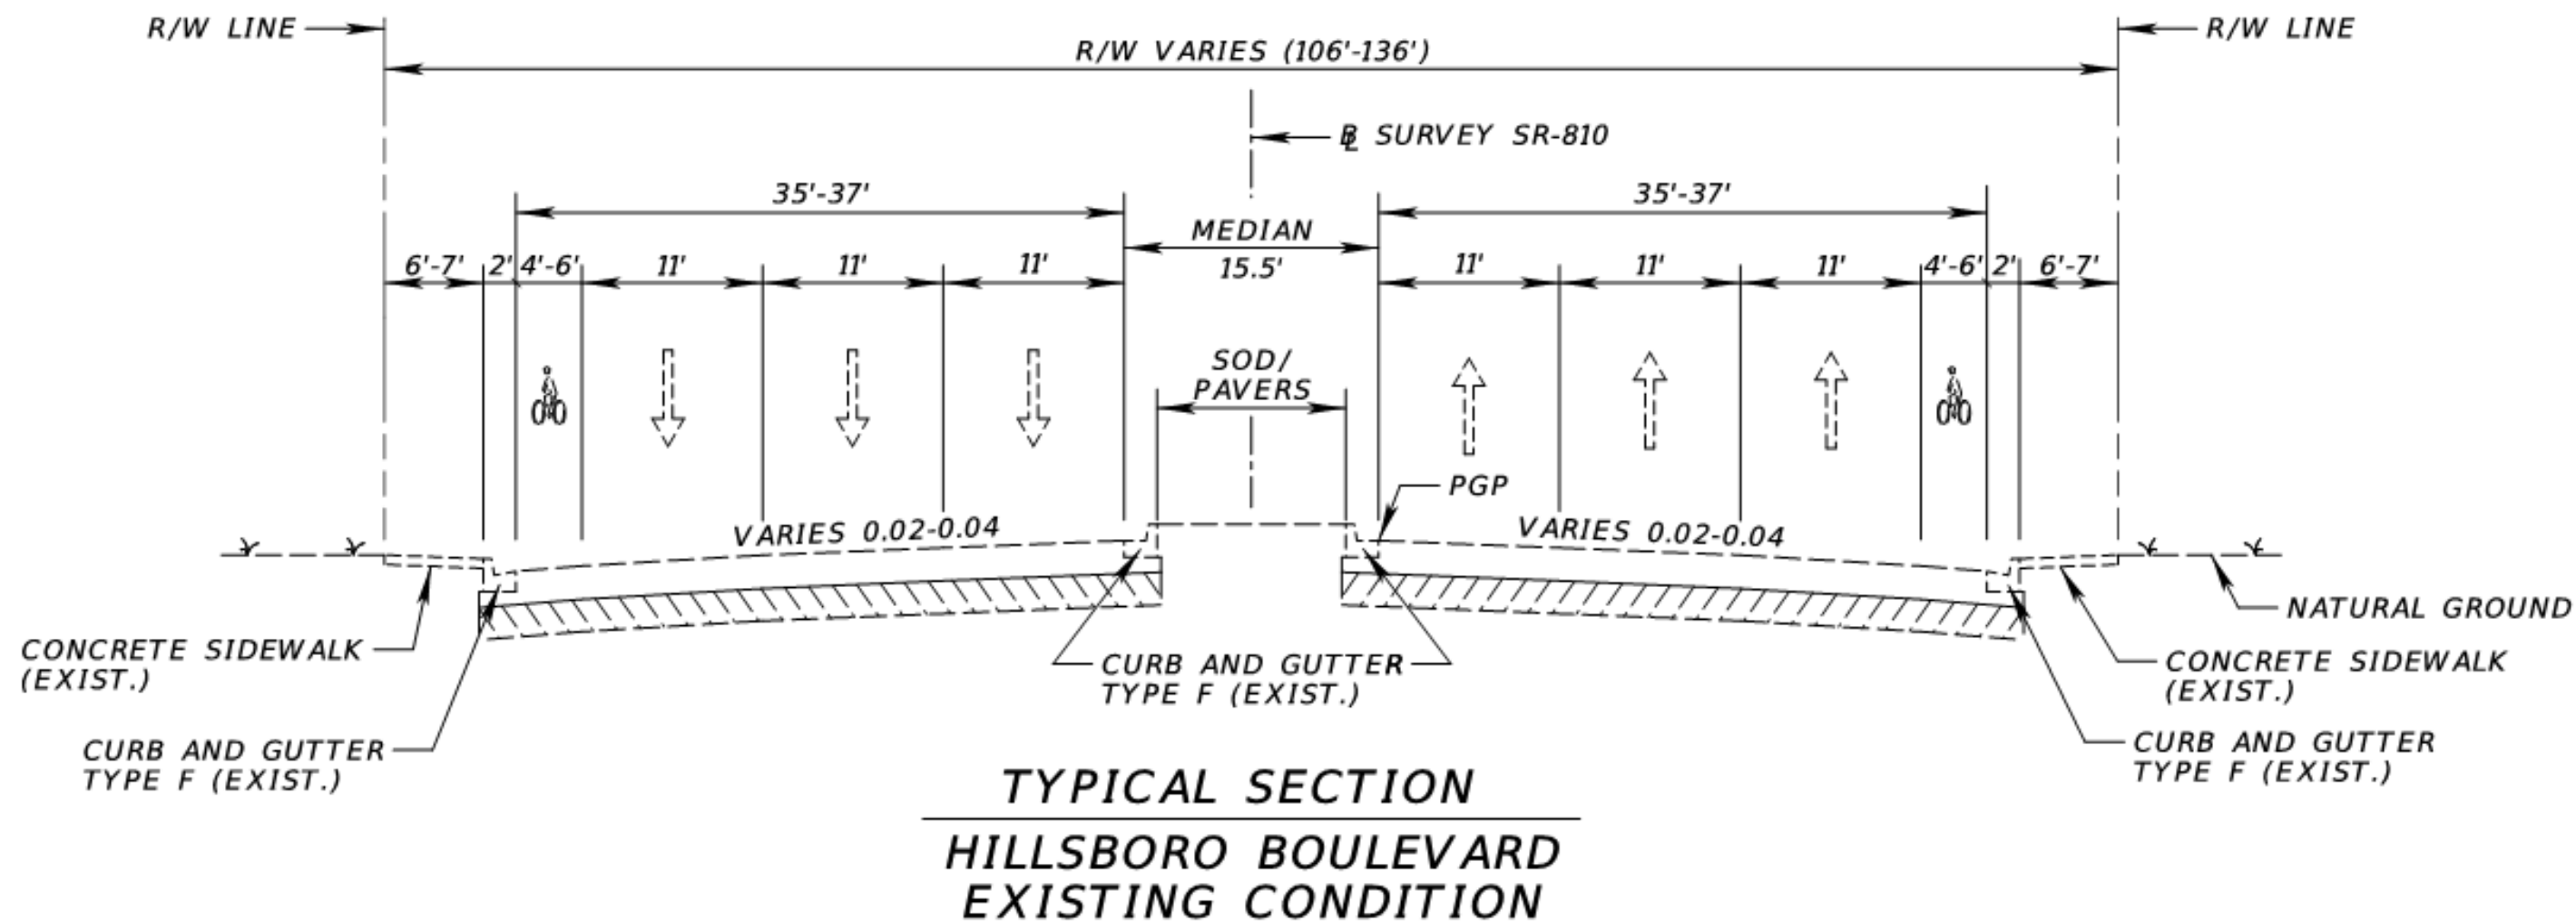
6: Existing Typical Section - Hillsboro Boulevard
